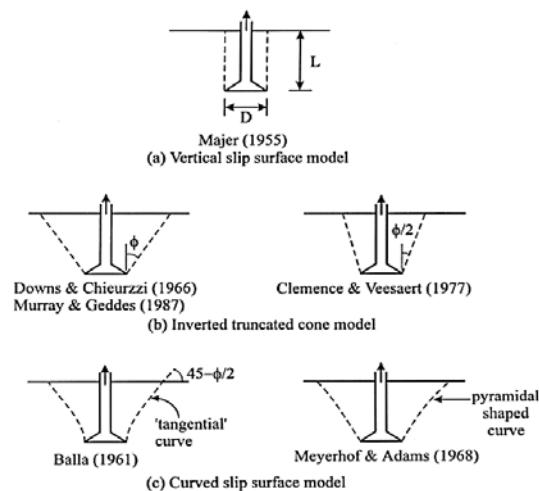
Assumed failure mechanisms for belled piers subject to uplift loads [12].
